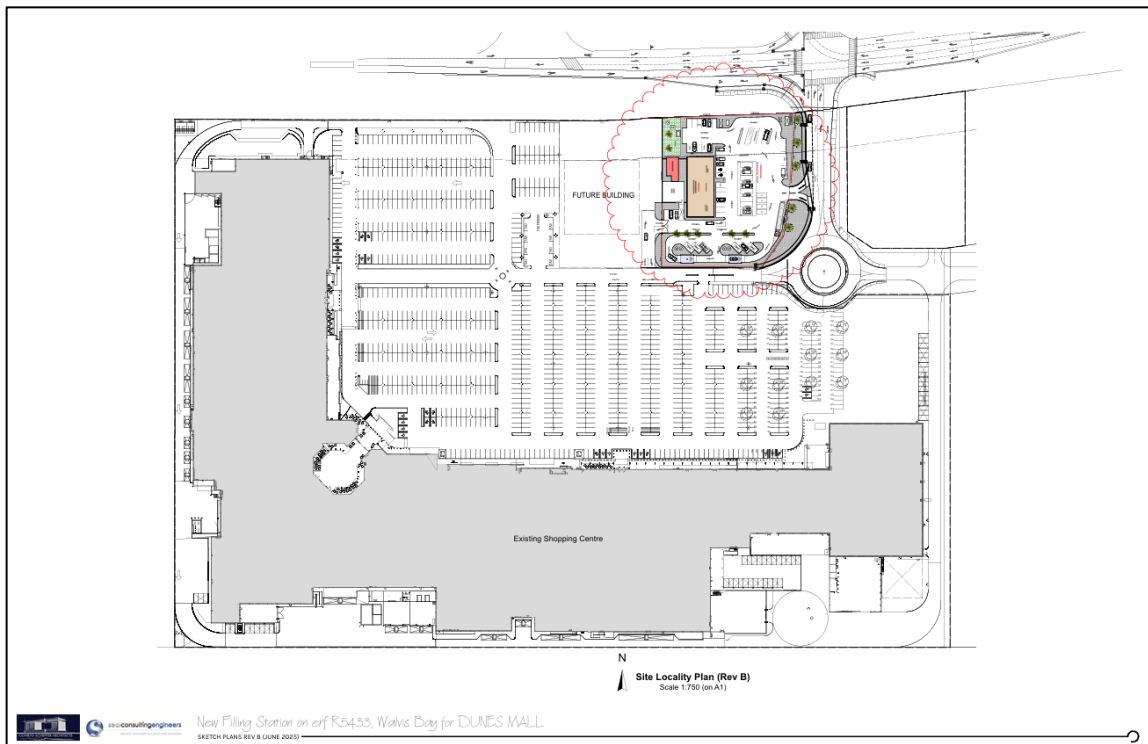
Proposed Site Plan (Conrad Scheffer Architects, 2025)
